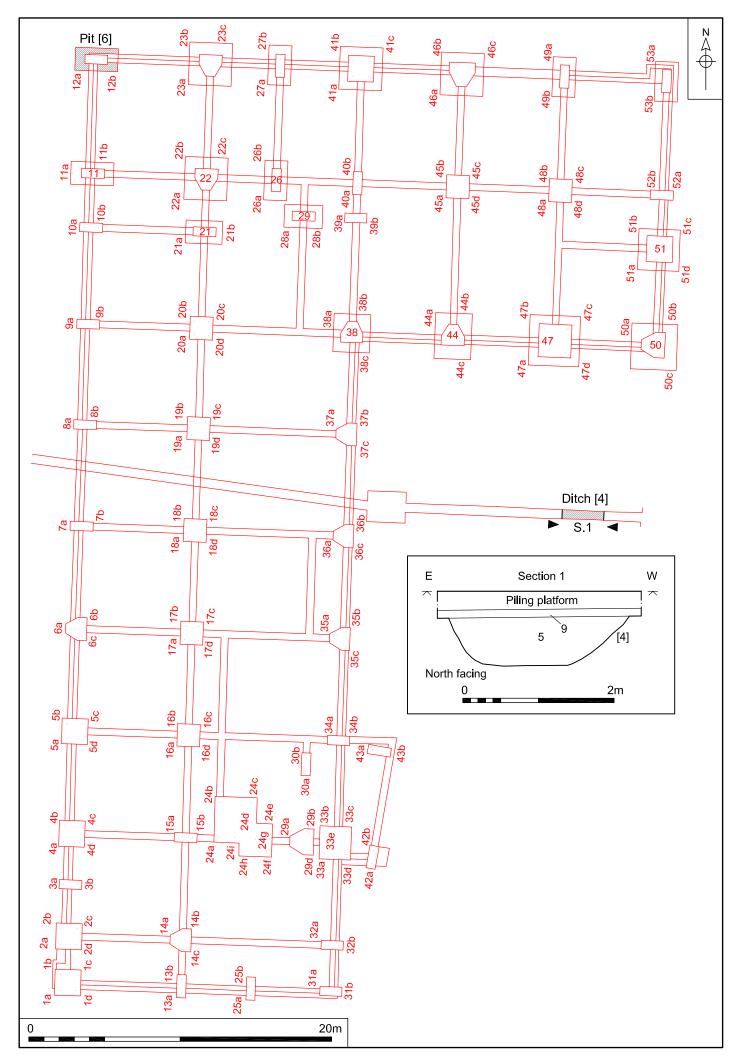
Piling plan. Scale 1:250. Inset of section 1 at 1:50
